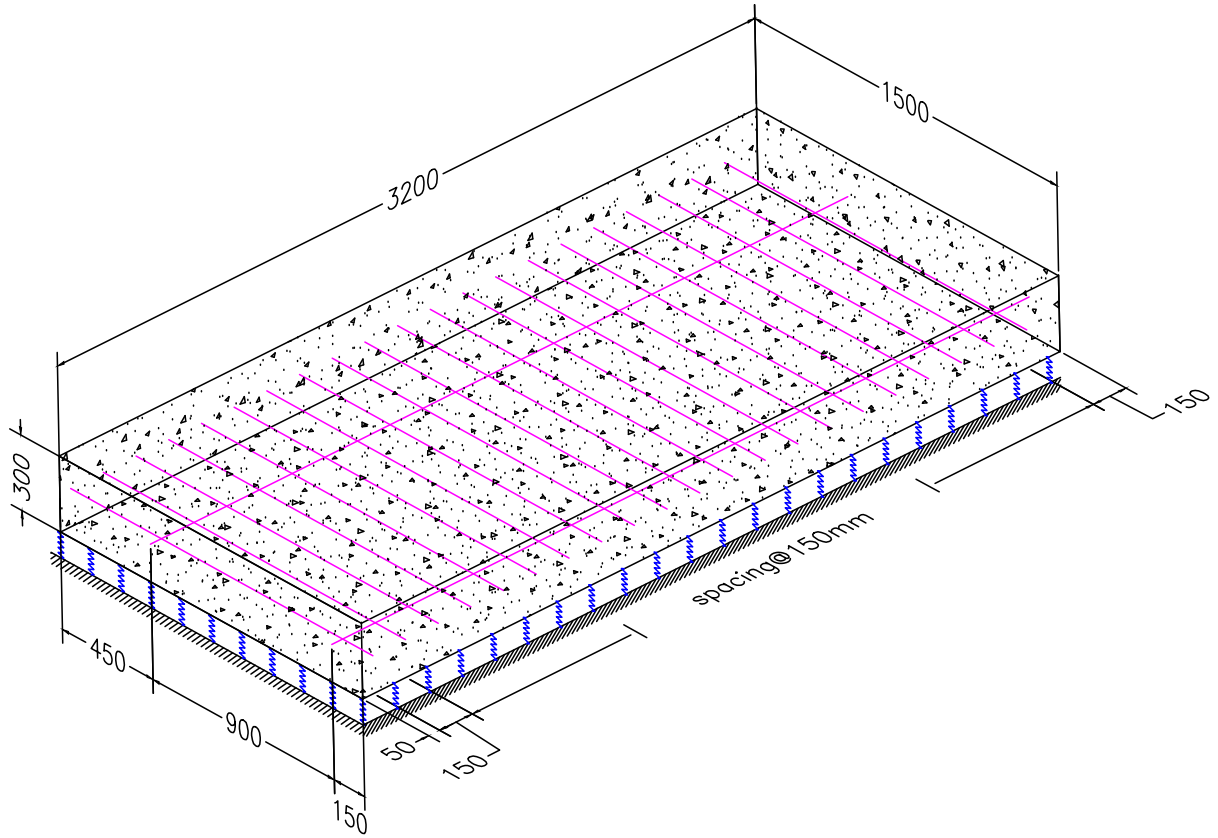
Three-dimensional cracked section of CRCP dimensions
